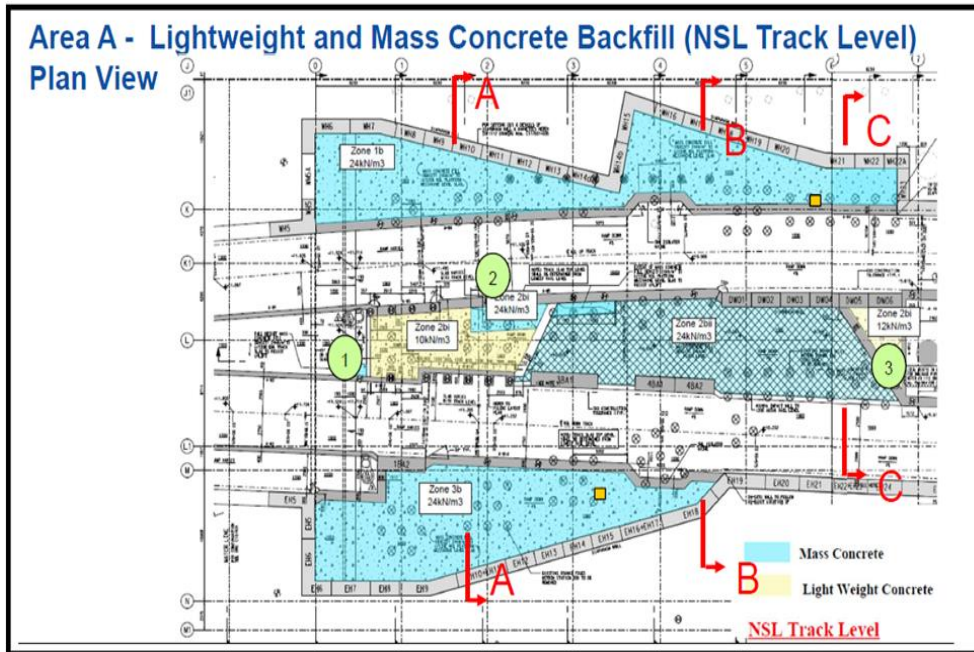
Plan view of backfilled areas at NSL Track Level
